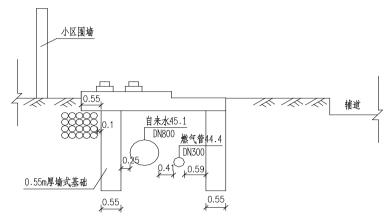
Pipeline no migration and adjustment of stairway foundation plan (m)
